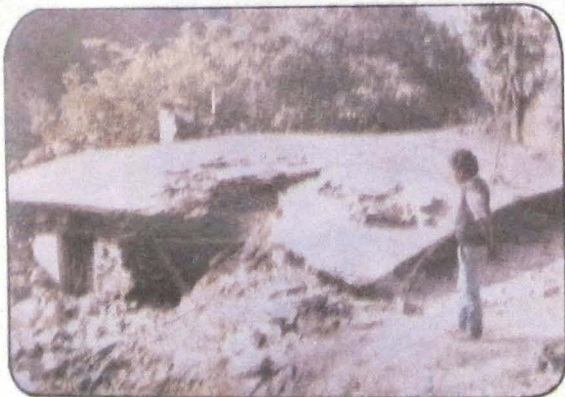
Collapse of a house in Netala village. Note bending of the RCC slab.
